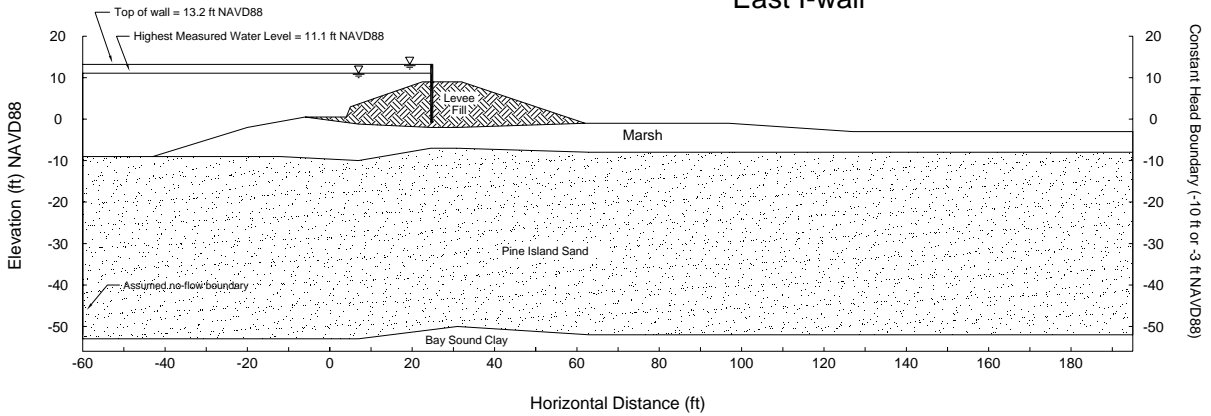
Schematic Cross Section at Orleans South, with Seepage Boundary Conditions
